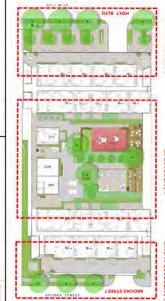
Common Space 3rd Floor Planting Palette
